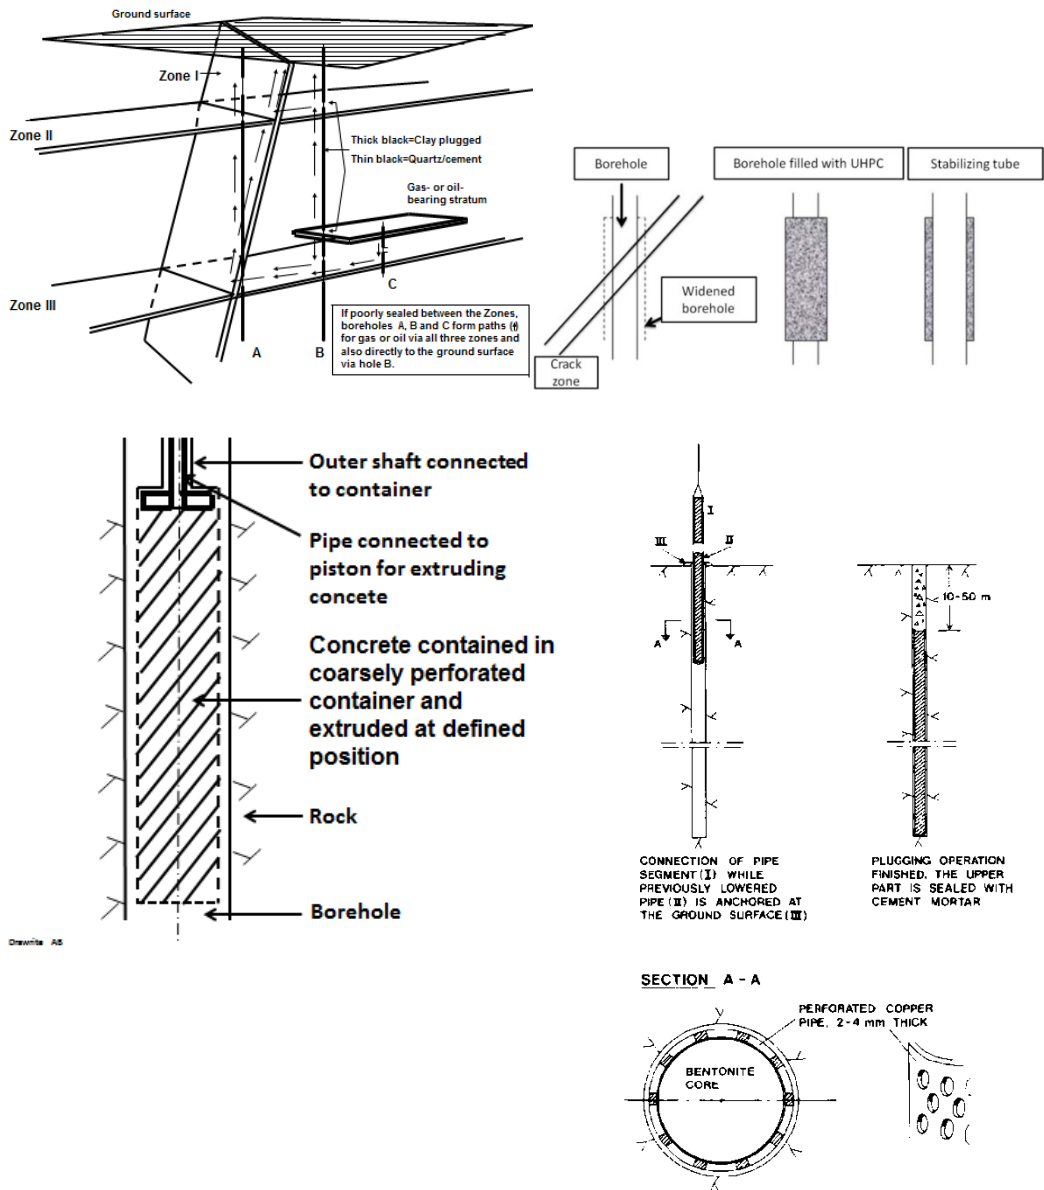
Upper left: Flow paths for gas and oil via short-circuiting boreholes. Concrete (quartz/cement) cast after reaming where fracture zones are intersected. Upper right: Reaming for casting concrete plug. Lower left: Equipment for placing a specific amount of coherent concrete. Lower right: Placement of clay seal of dense bentonite confined in perforated metal tube.
